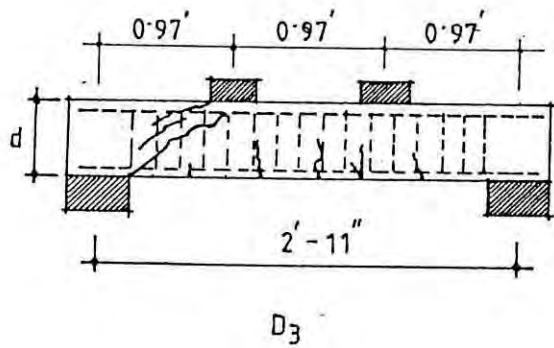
Crack Pattern of Reinforced Concrete Beam Group D
